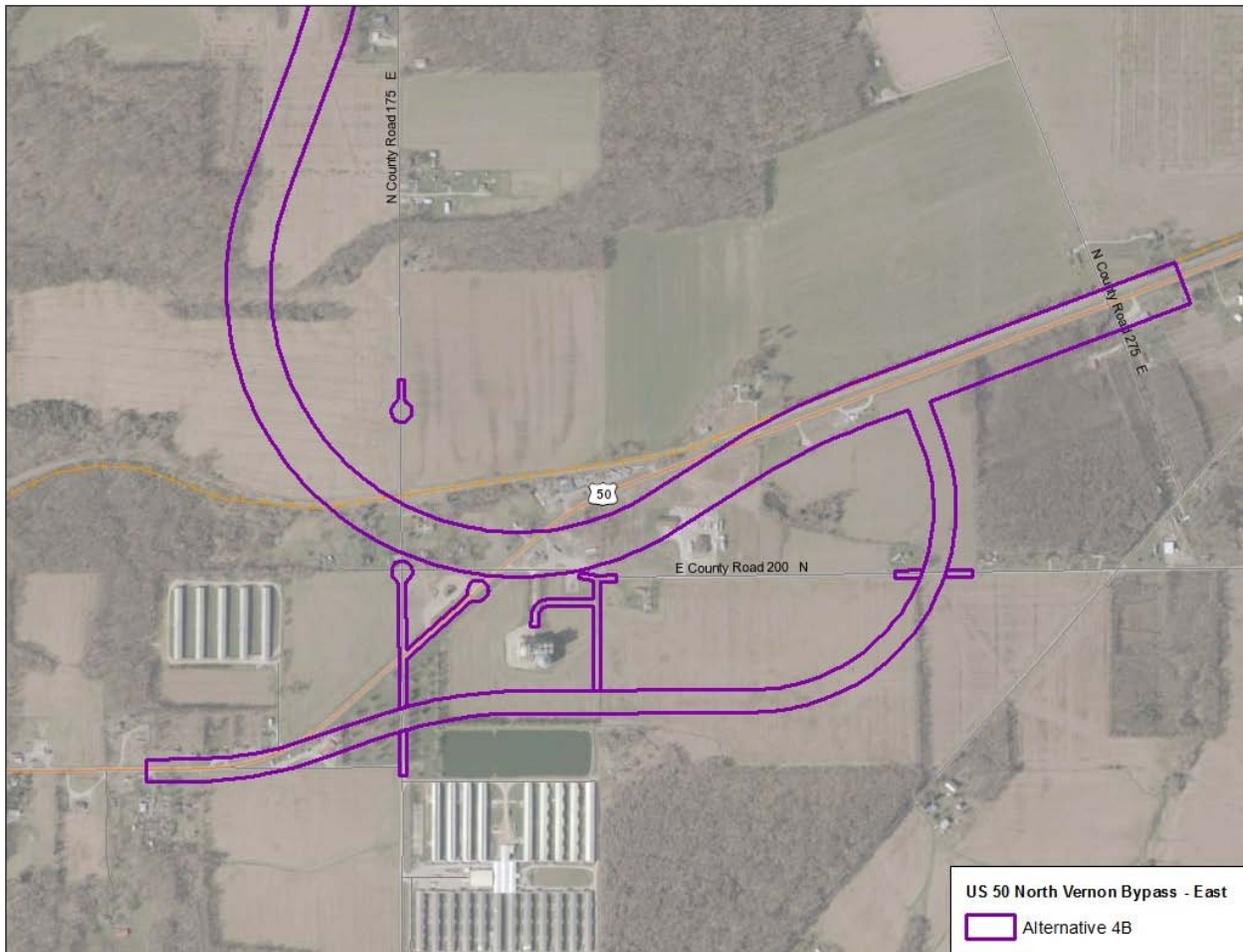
ALTERNATIVE 4 CONNECTION TO U.S. 50
